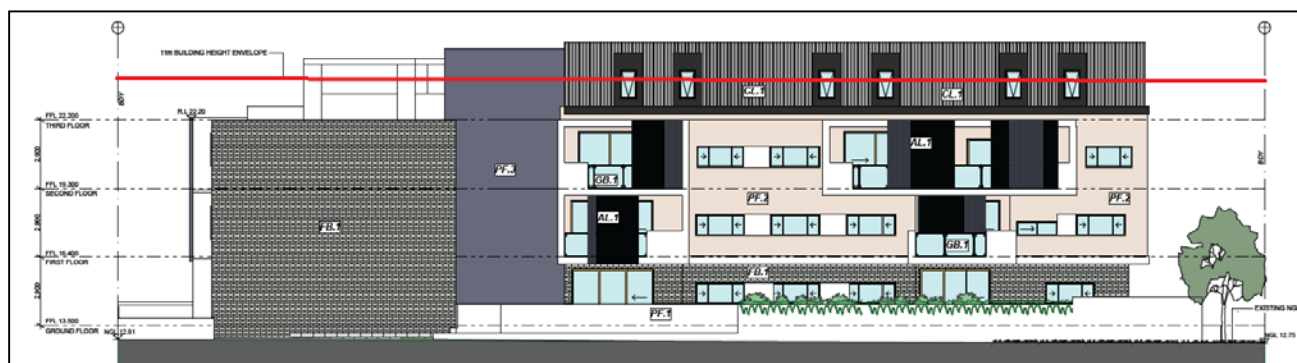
View of the eastern elevation noting the extent of the proposed building height variation.
